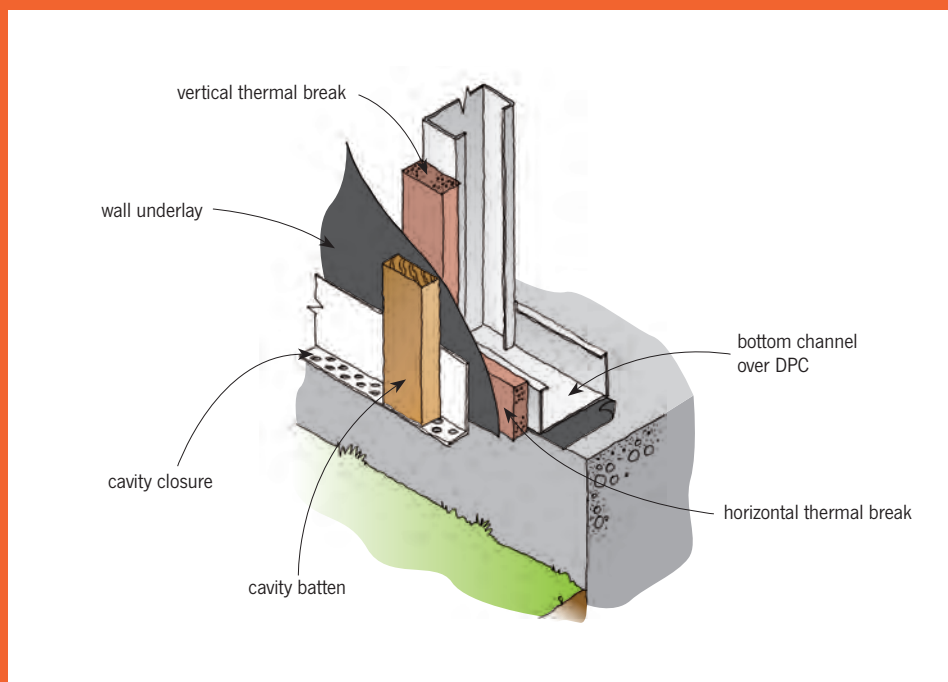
Installation of wall underlay over thermal break plus cavity battens (wall cladding, slab reinforcing and insulation not shown).
